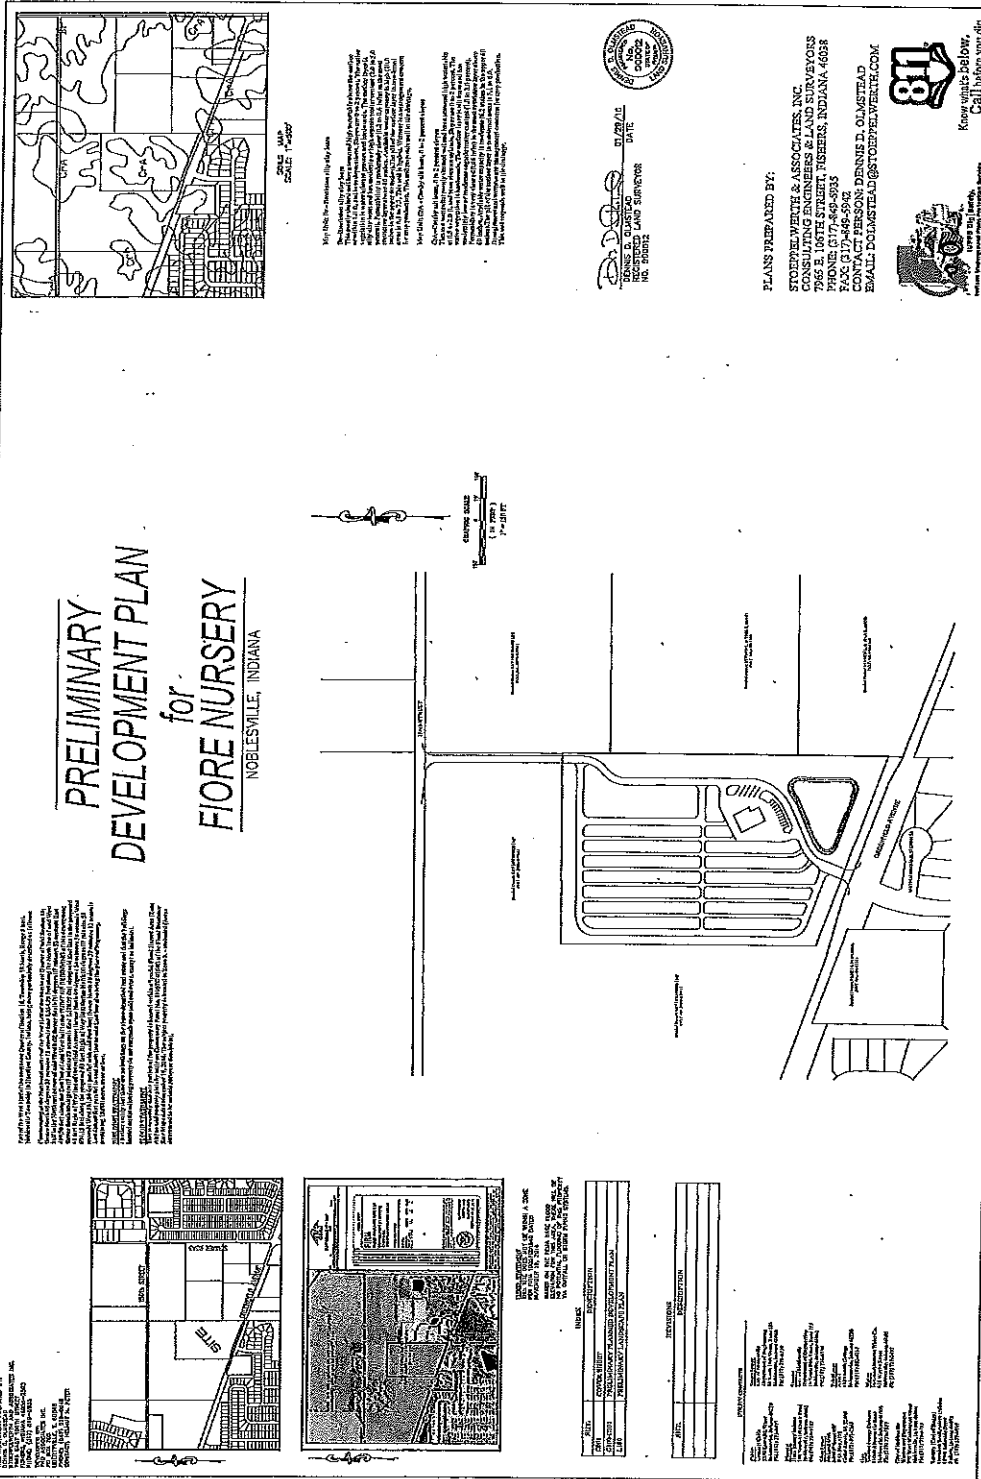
PRELIMINARY DEVELOPMENT PLAN
